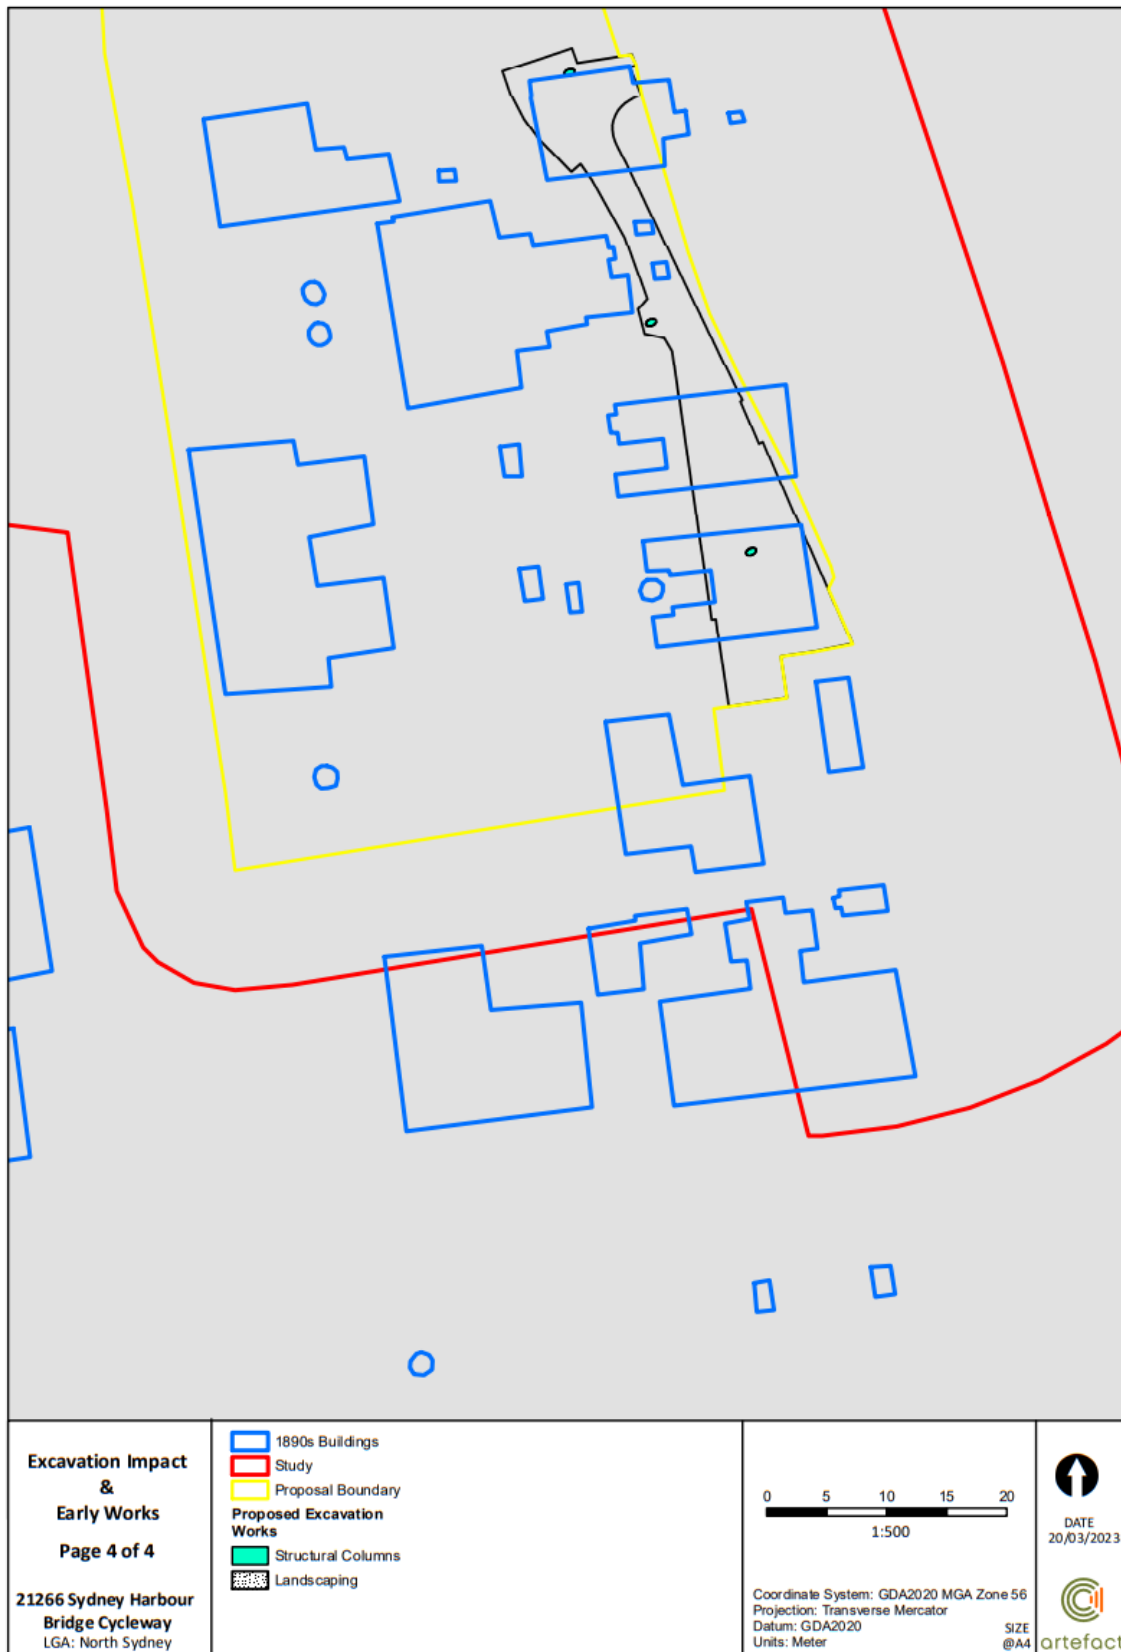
Proposed excavation impacts and intersection with potential Phase 2 archaeological remains (as detailed from 1891 Sydney Water Board plans)
